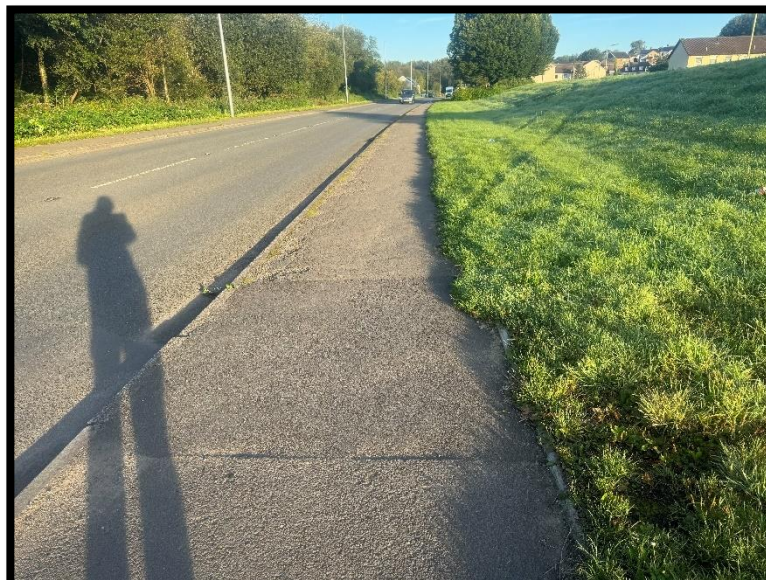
Footway parking on eastern footway of Canal Road
